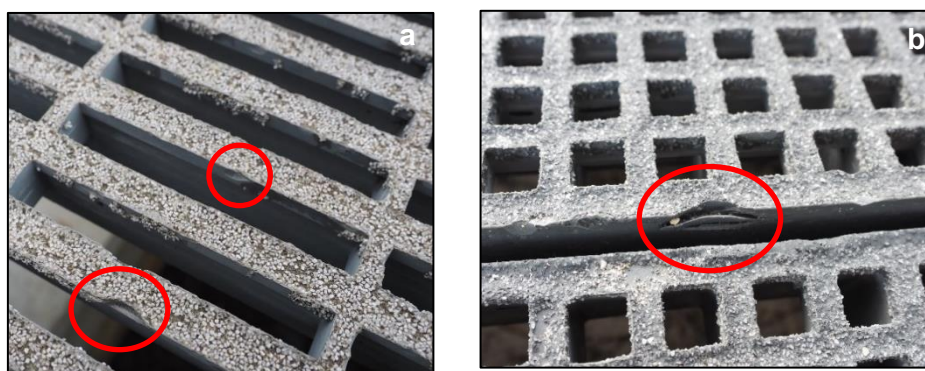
Chipping on grating at Kent Street Weir Bridge (a) and on edging of the beach access ramp at John Tonkin Reserve (b).
